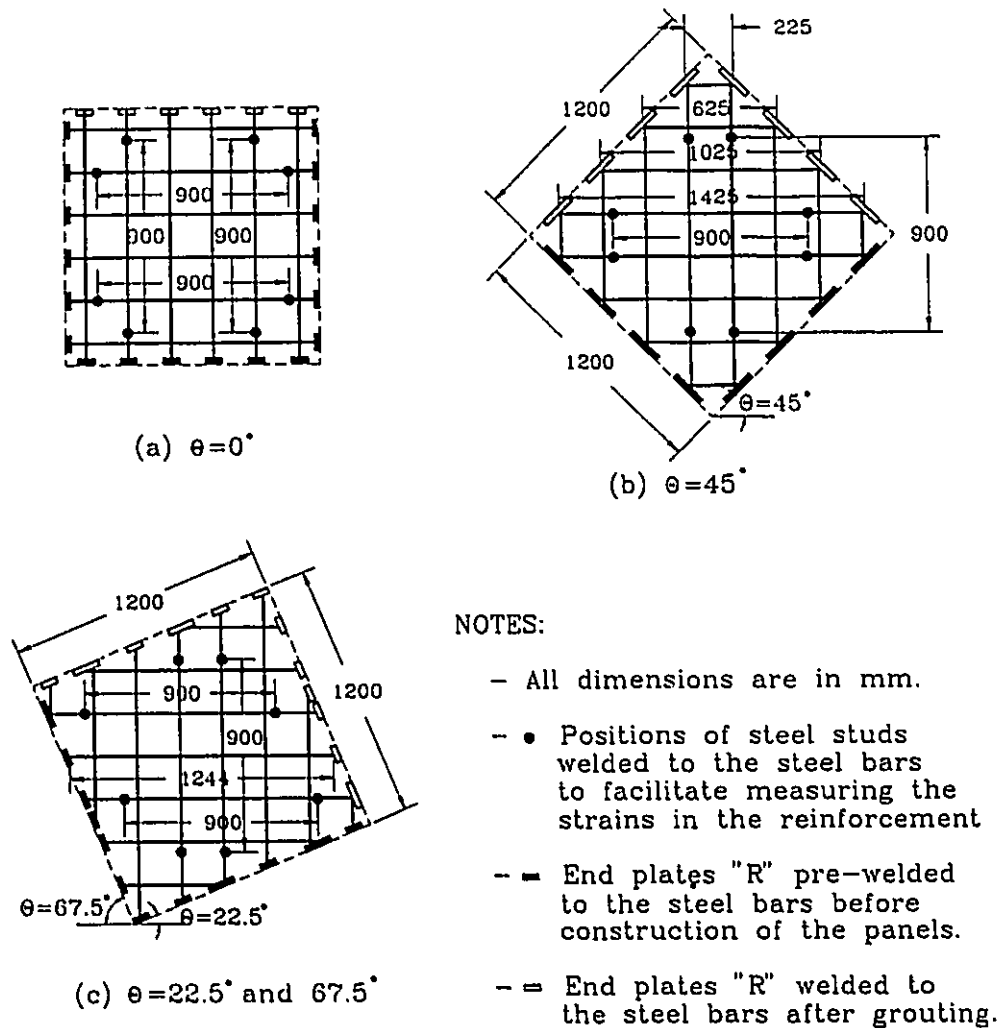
Reinforcement layouts for the panels of series RP.
